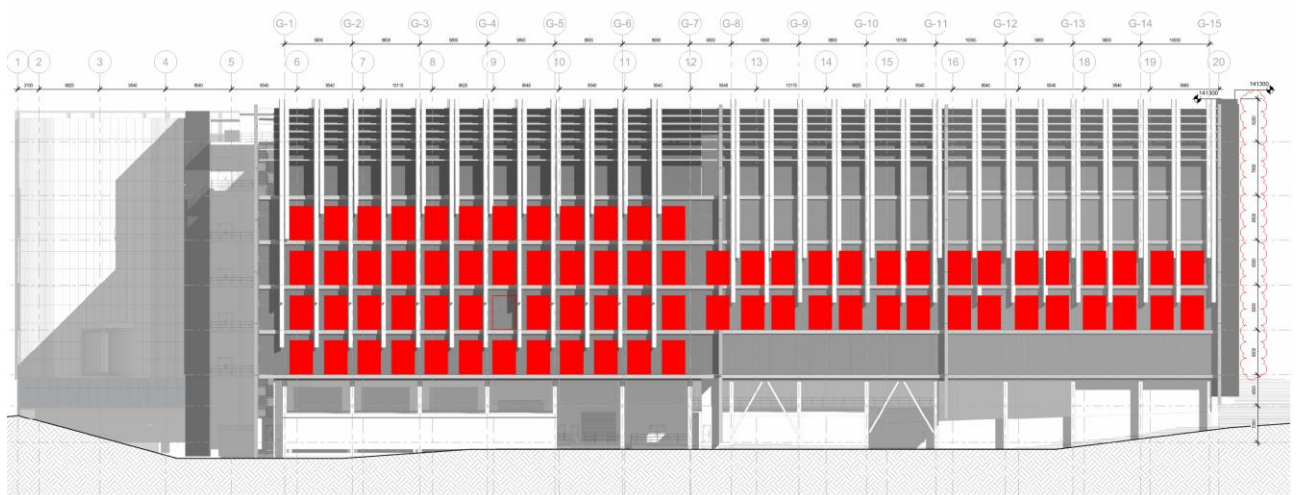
Location of Generators on Proposed Site - South Elevation (Red)
